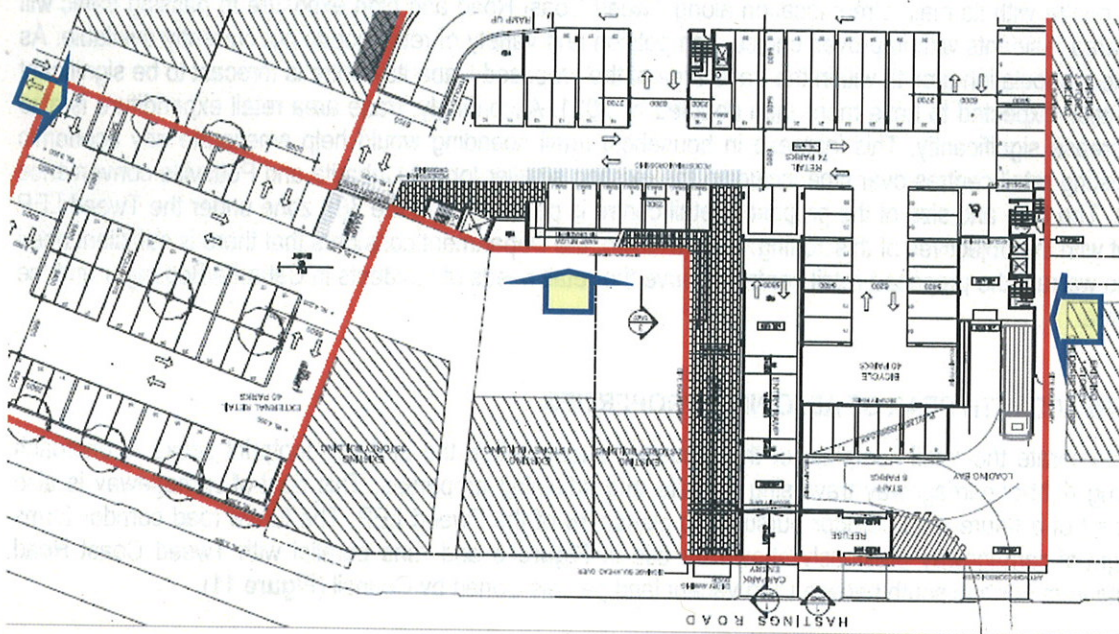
Exhibited proposal with floorplate encroaching over future road corridor with service vehicle access being diverted around the development via Hastings Road (Source: Environmental Assessment).
